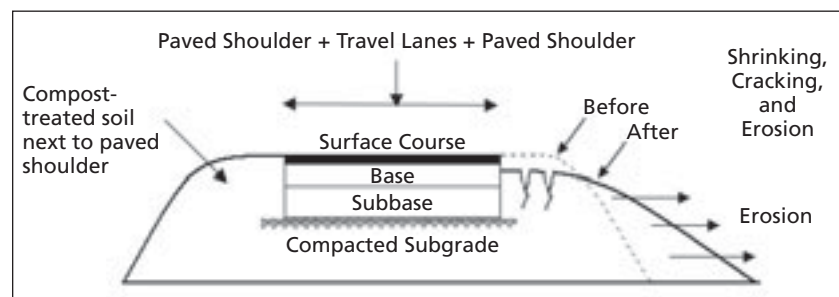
Schematic Showing Subgrade Cracking and Erosion That Could Lead to Pavement Cracking (not drawn to scale).
